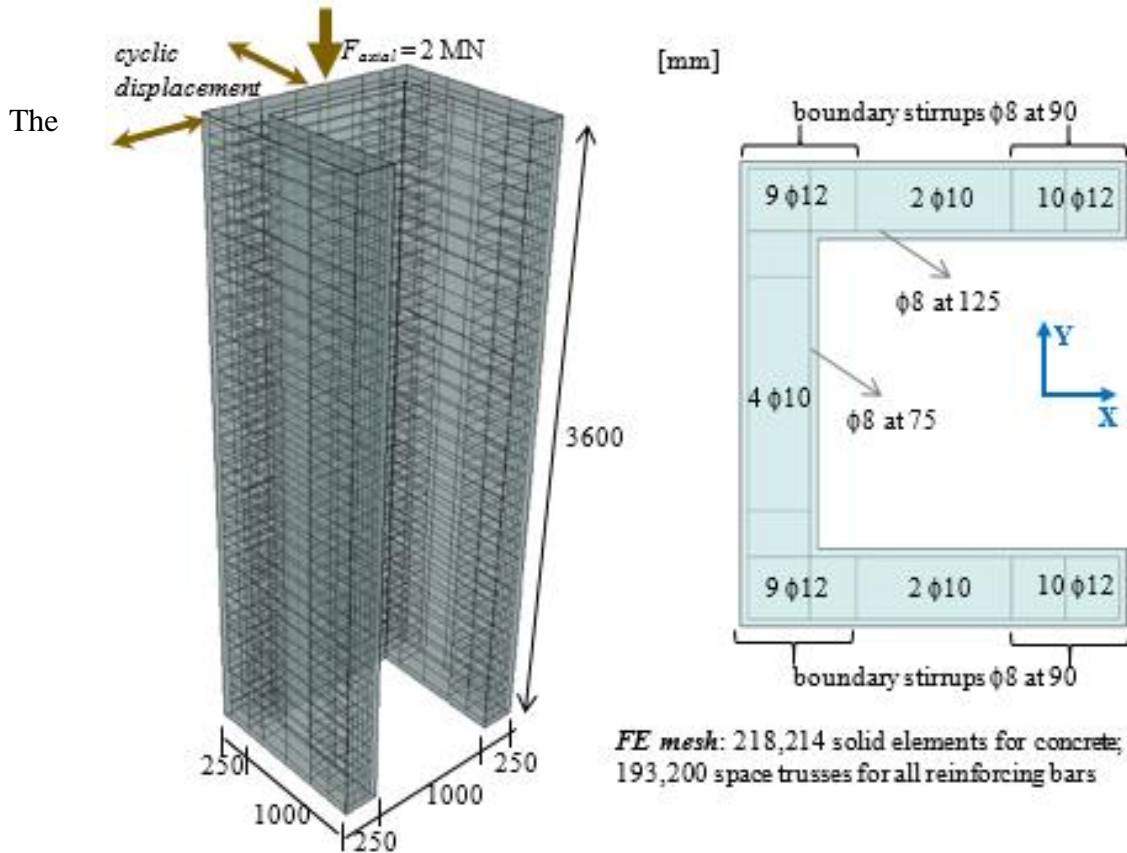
Multi-axial cyclic loads, reinforcements layout, overall geometry, finite element meshes and plan view. Entire reinforcements are explicitly modeled by space trusses
